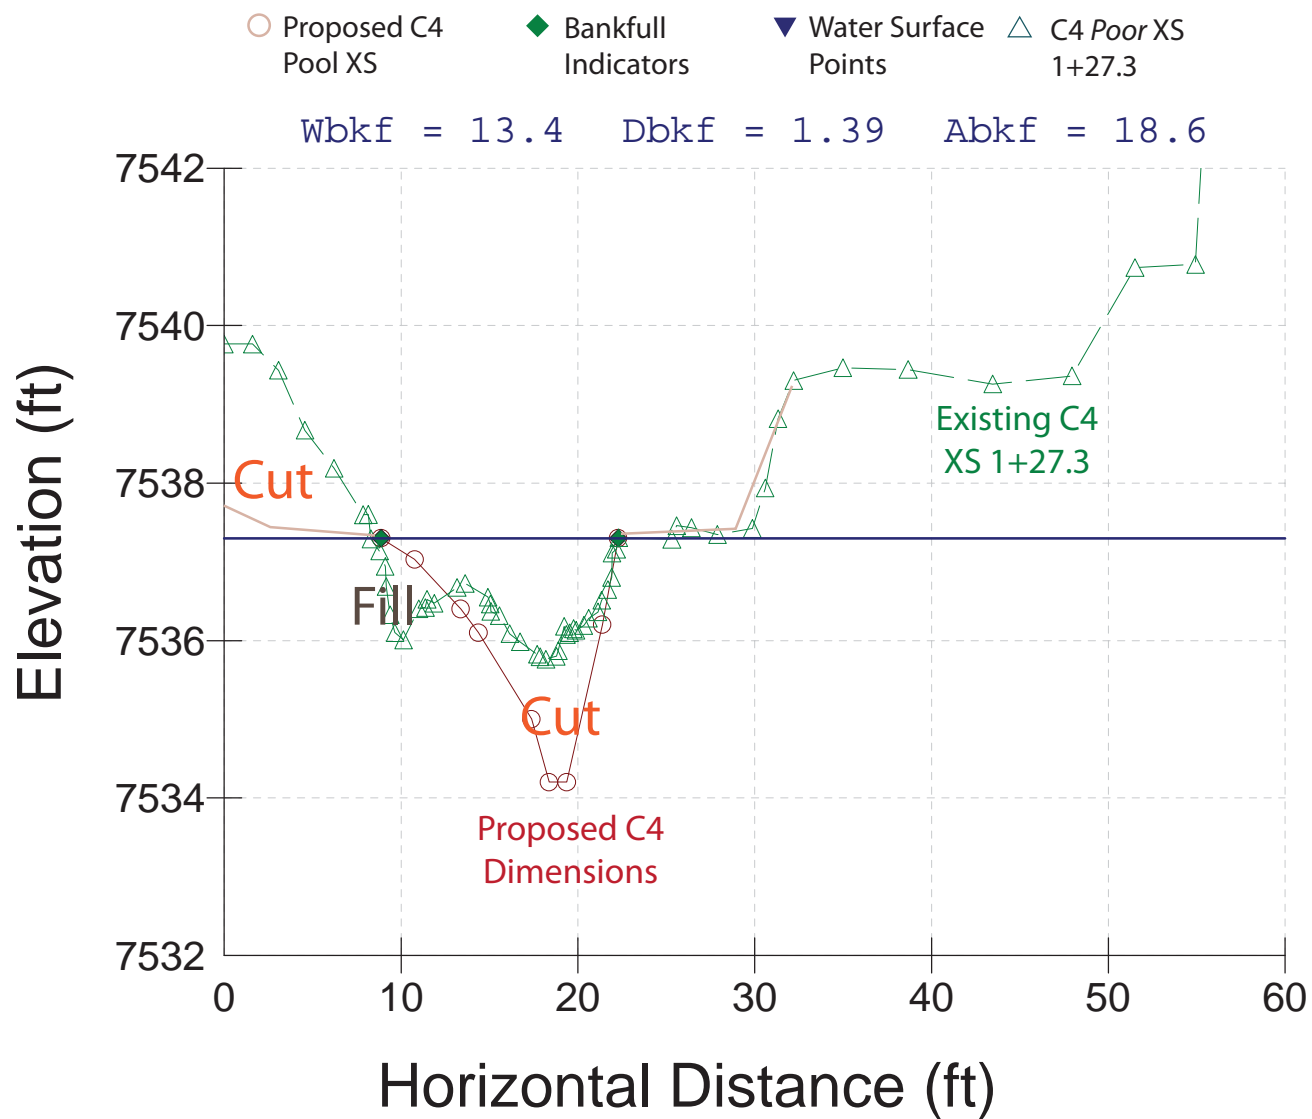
The proposed C4 *Stable pool* cross-section compared to the existing C4 *Poor* cross-section 1+27.3 showing the cut and fill recommendations and reconnecting the channel with the floodplain.
